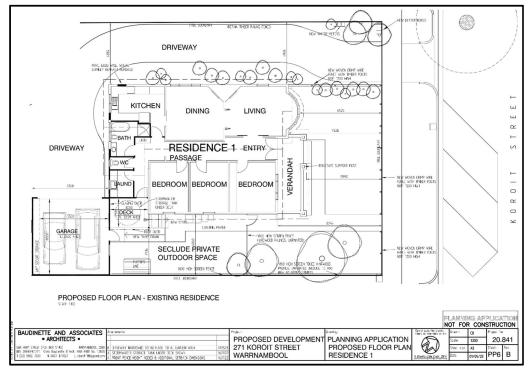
Proposed Floor Plan - Existing Dwelling. Source: Application Documents.
